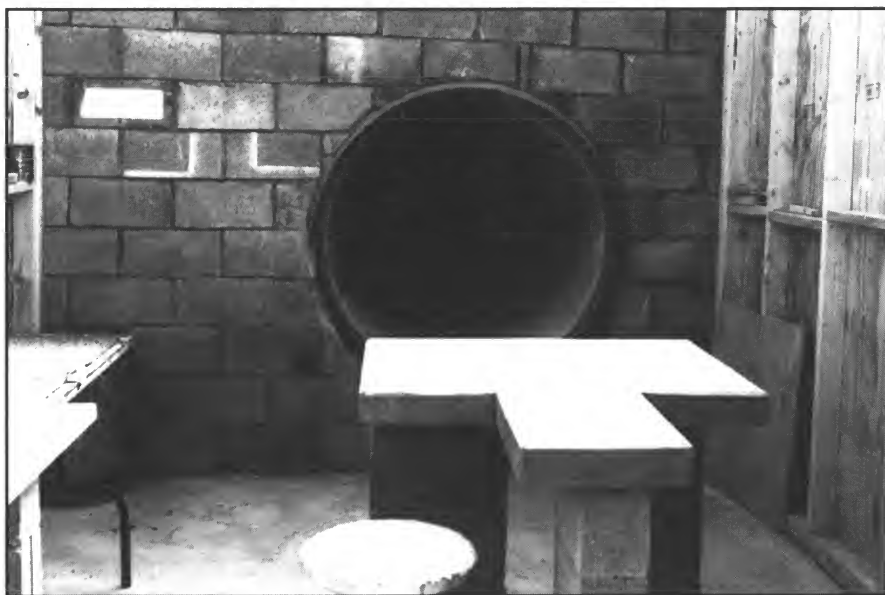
Photo of the interior of the building showing concrete bench and entrance of the 100 yard tunnel.
